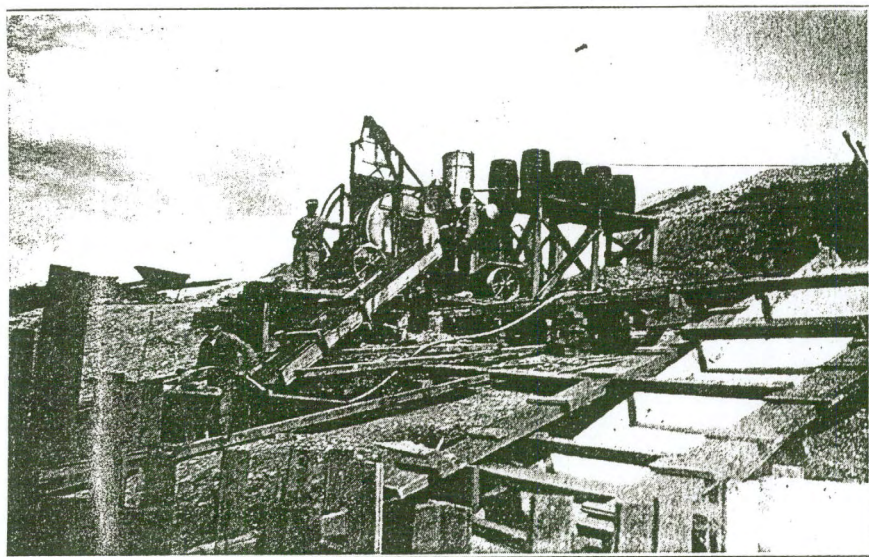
First Set-up of Mixer for Footings of East Abutment of Judith River Viaduct.
